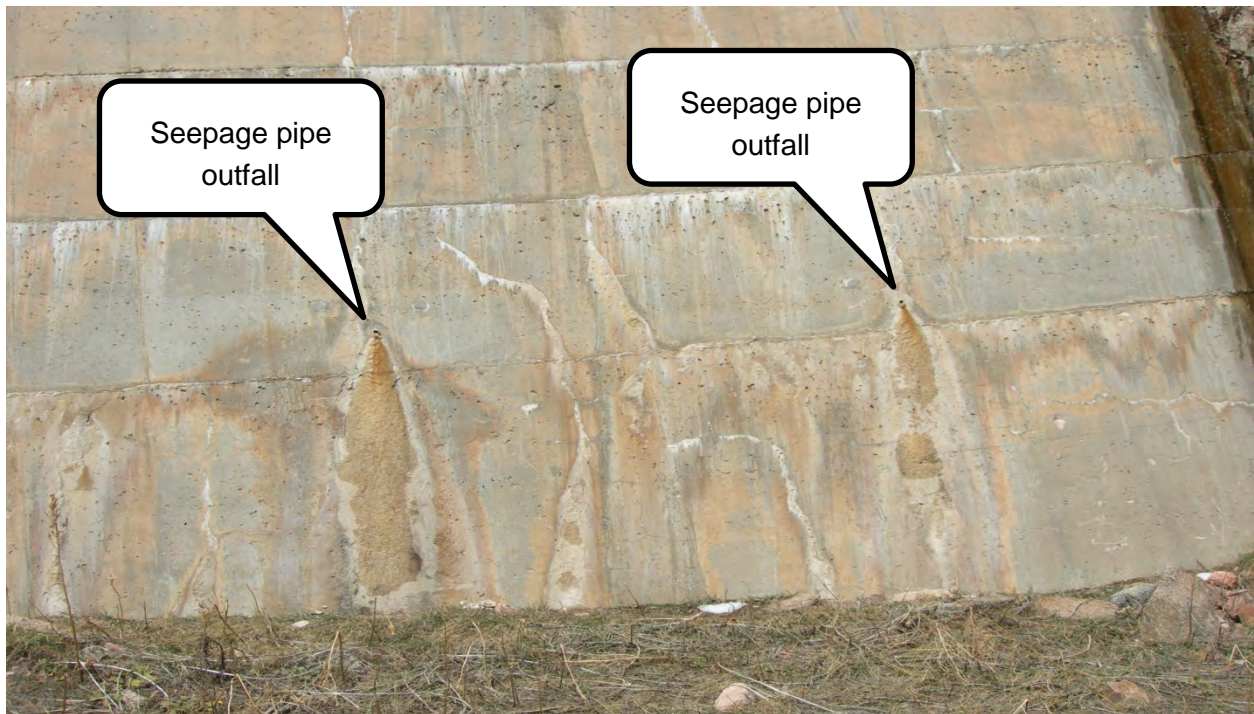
Internal seepage pipes near left abutment. Calcium deposits developing below outfalls. (May 6, 2013)
